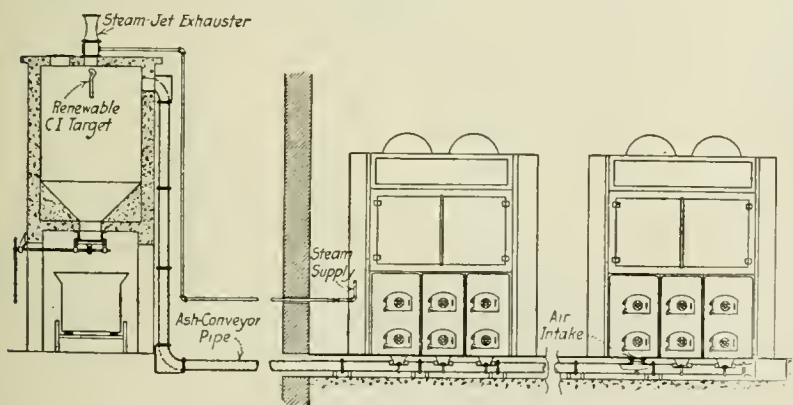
AIR CONVEYOR WITH VACUUM STORAGE TANK
